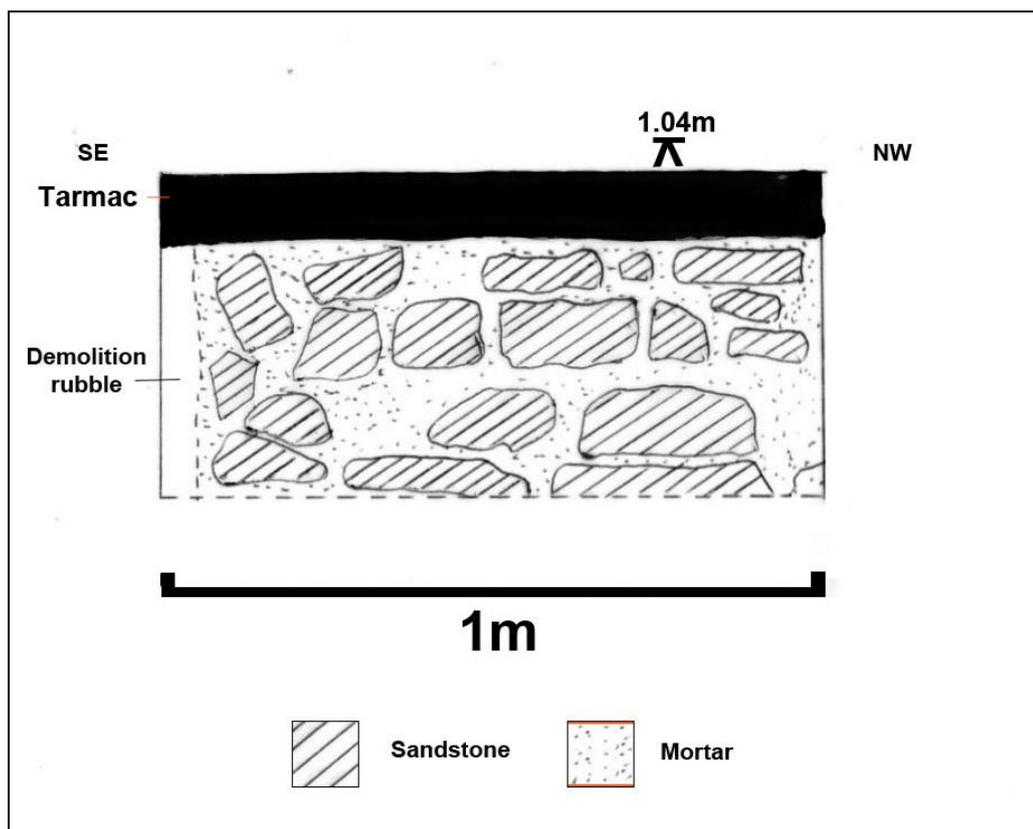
Section drawing of wall foundation [102] in pipe trench 1 drawn at 1:10.
